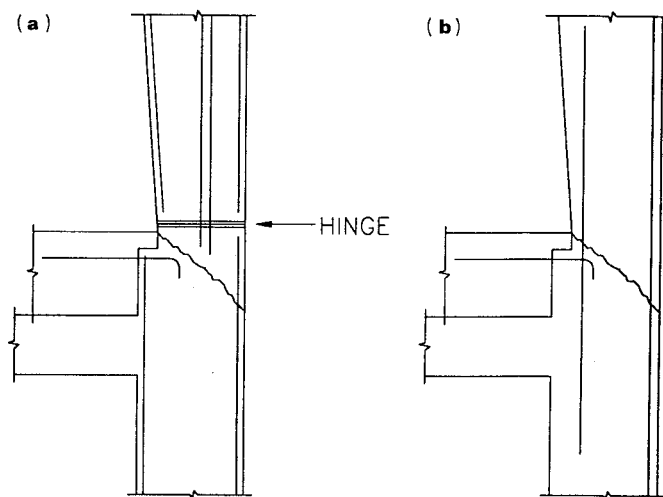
Schematic illustration of joint failure at (a) hinged base of upper column and (b) continuous base of upper column.
